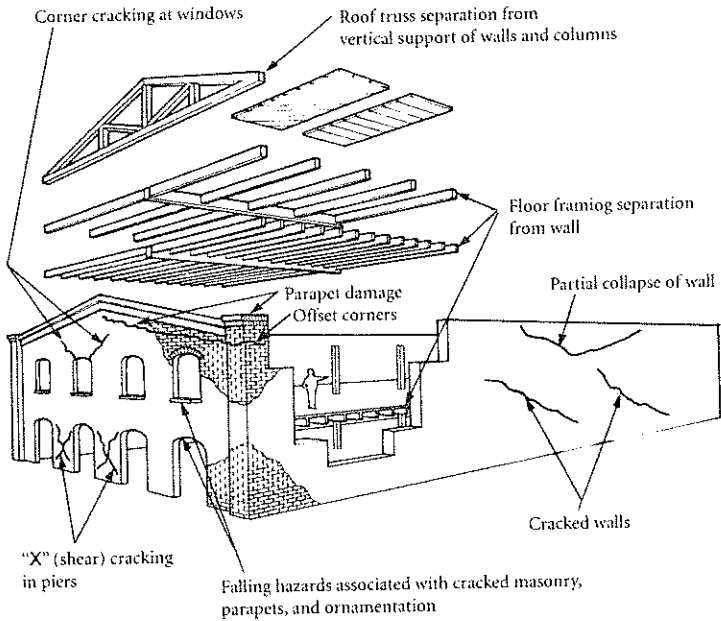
Inspection points for low-rise unreinforced masonry bearing-wall buildings.
